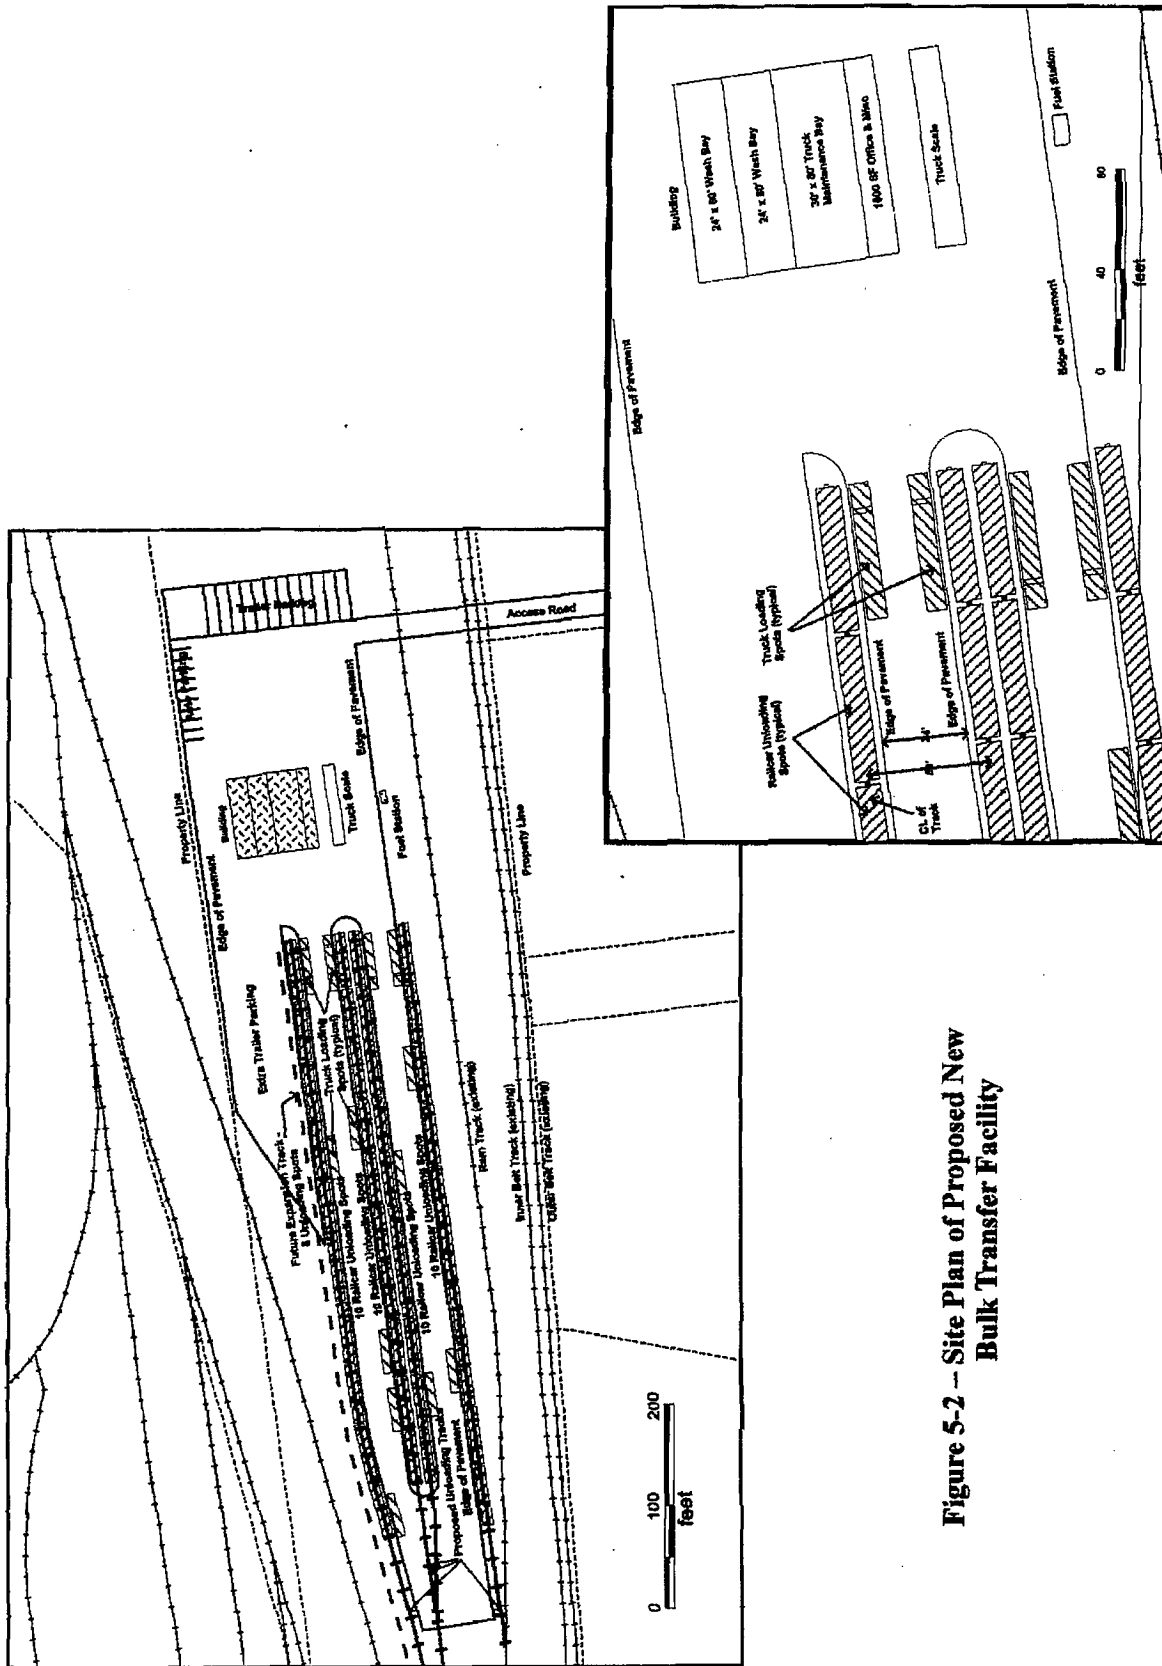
Site Plan of Proposed New Bulk Transfer Facility
